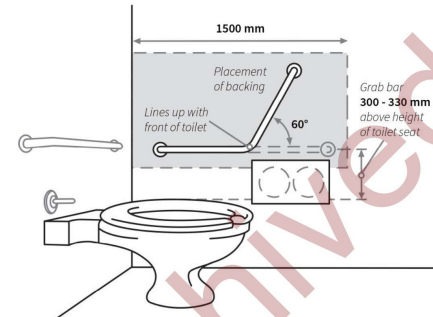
above from CSA B651 – Universal washrooms – Example layout (see Clause 6.3.1.1.)
